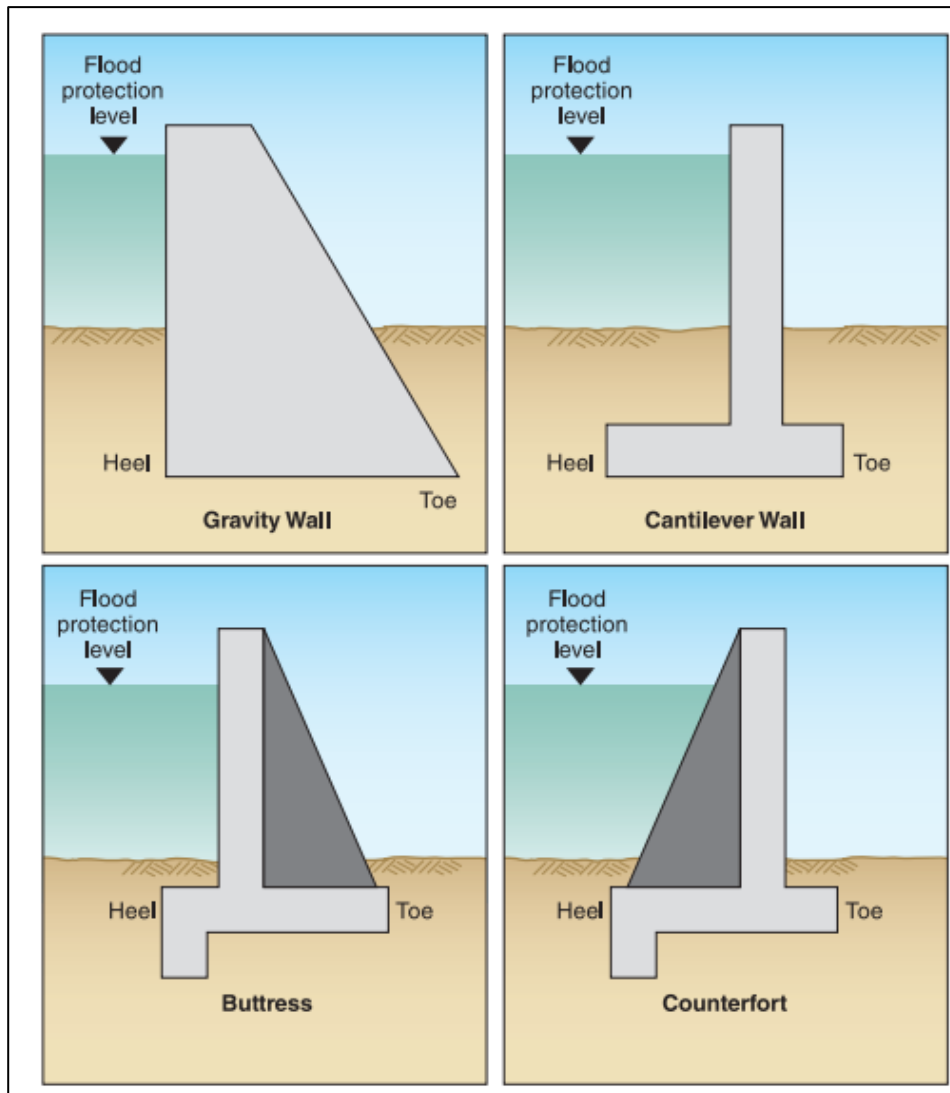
Gravity, Cantilever and Counterfort Floodwalls [30]
